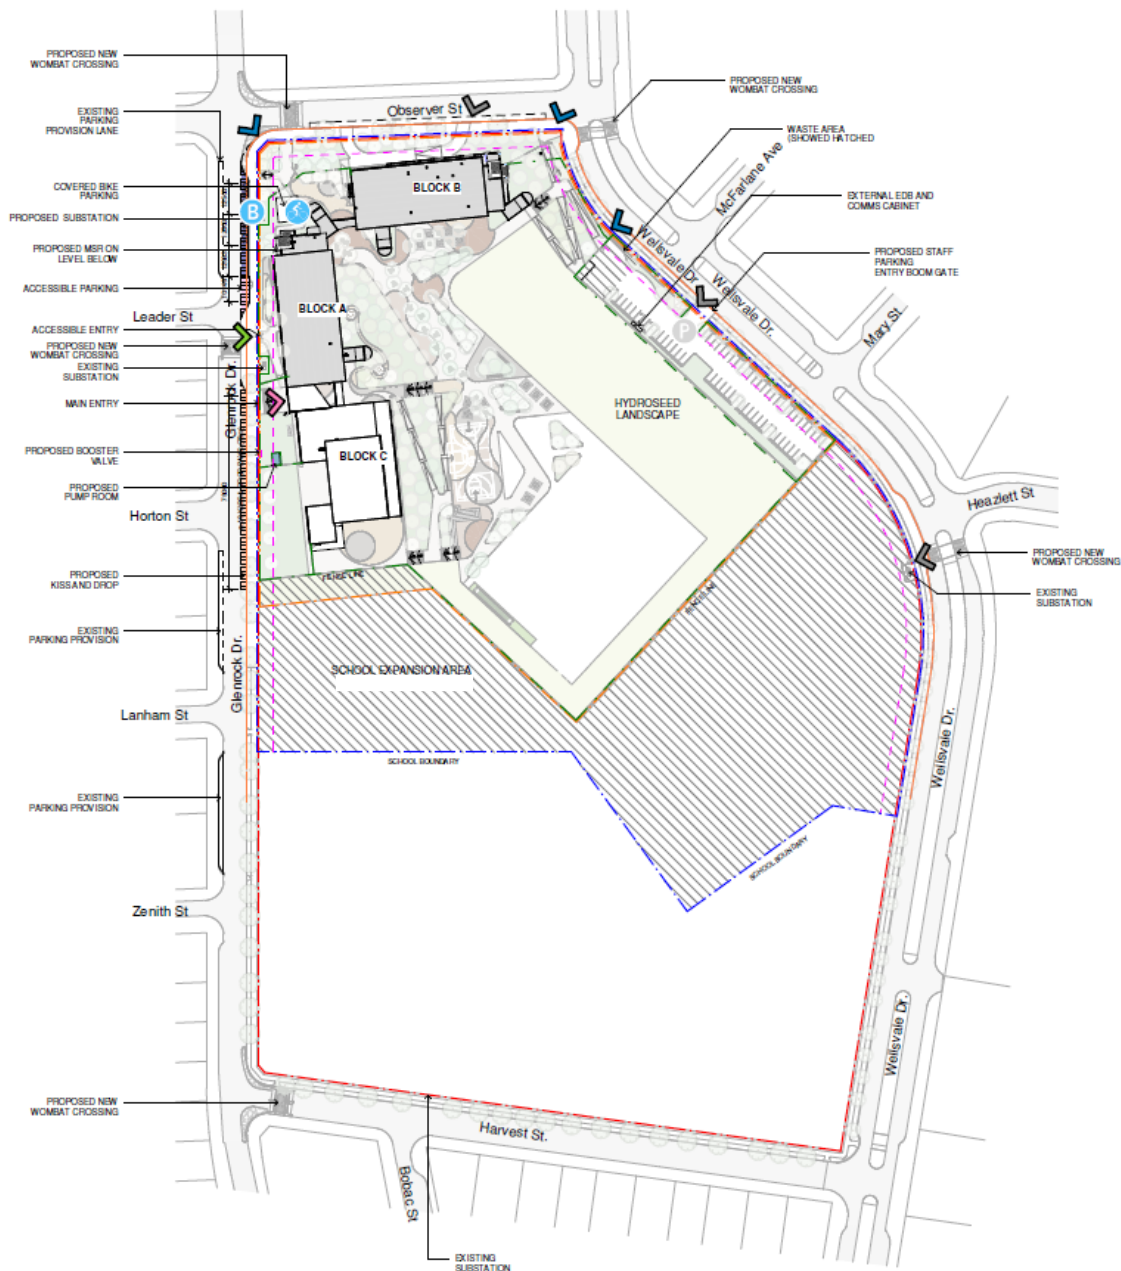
New High School of Googong – indicative only, subject to detailed design
